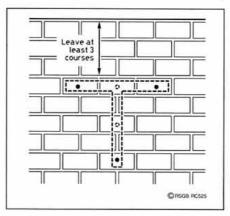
Typical drilling pattern for wall bracket. Patterns may vary, but always drill into the centres of the bricks.
